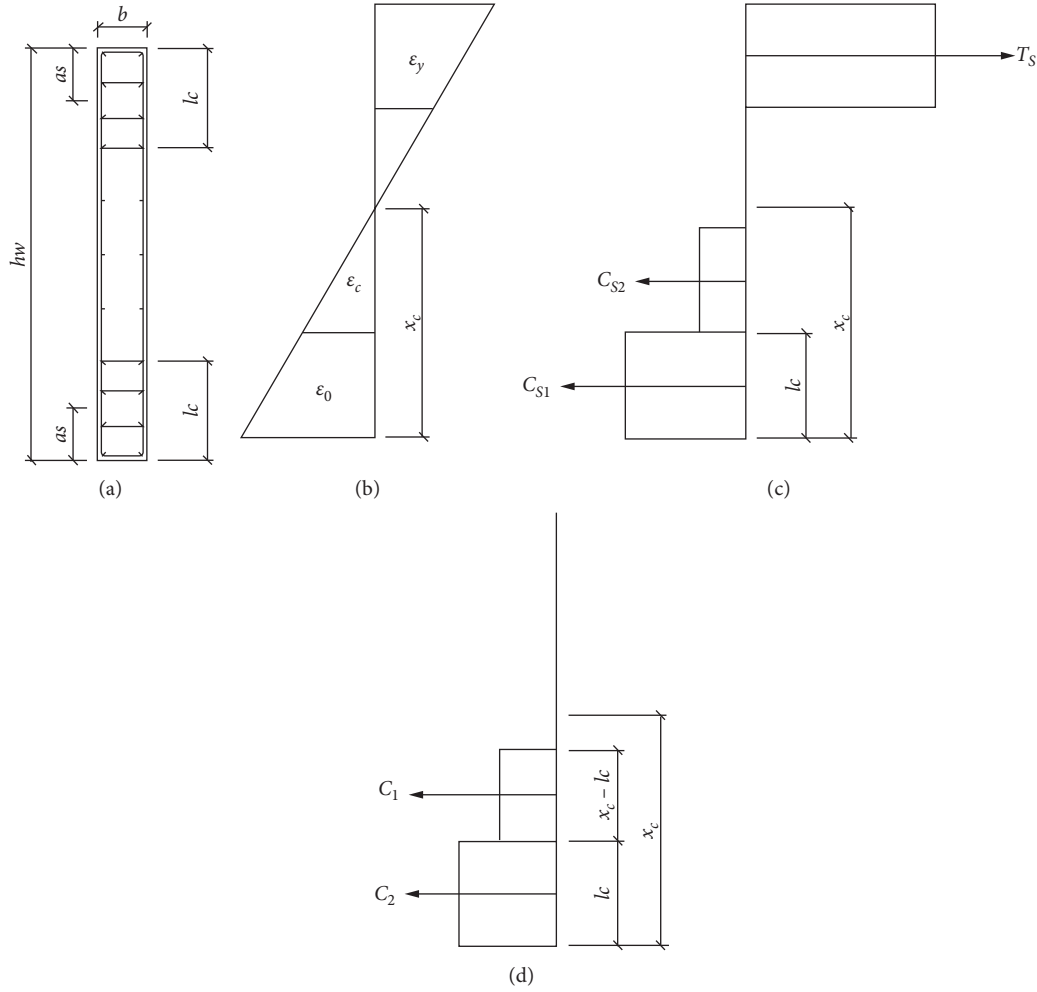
Calculation sketch of reinforced tenon joint precast shear wall. (a) Section size. (b) Strain distribution. (c) Steel stress. (d) Concrete stress.
